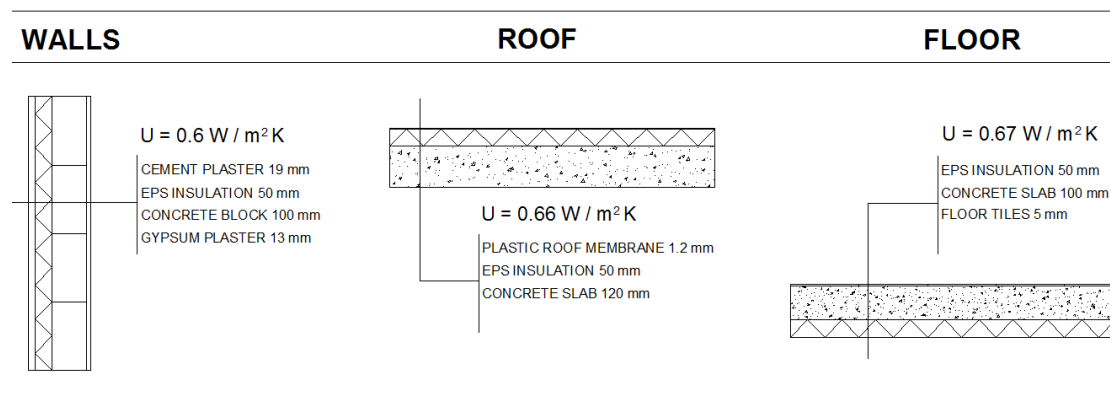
Wall, roof and floor construction of the heavy weight insulated building.
